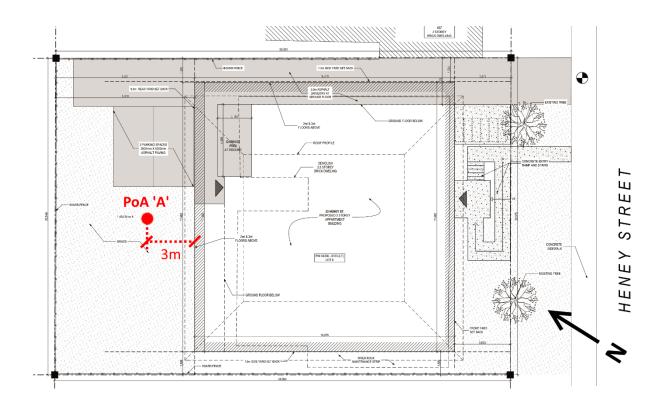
Site Plan at Grade, with Location of PoA 'A' (OLA)
